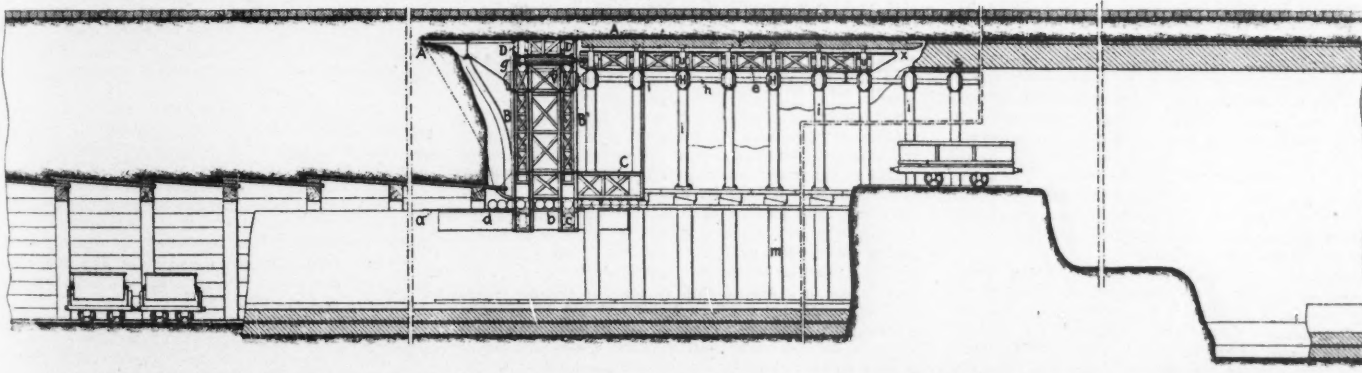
LONGITUDINAL SECTION THROUGH CENTER OF TUNNEL, SHOWING SHIELD AND CENTERING IN PLACE.
